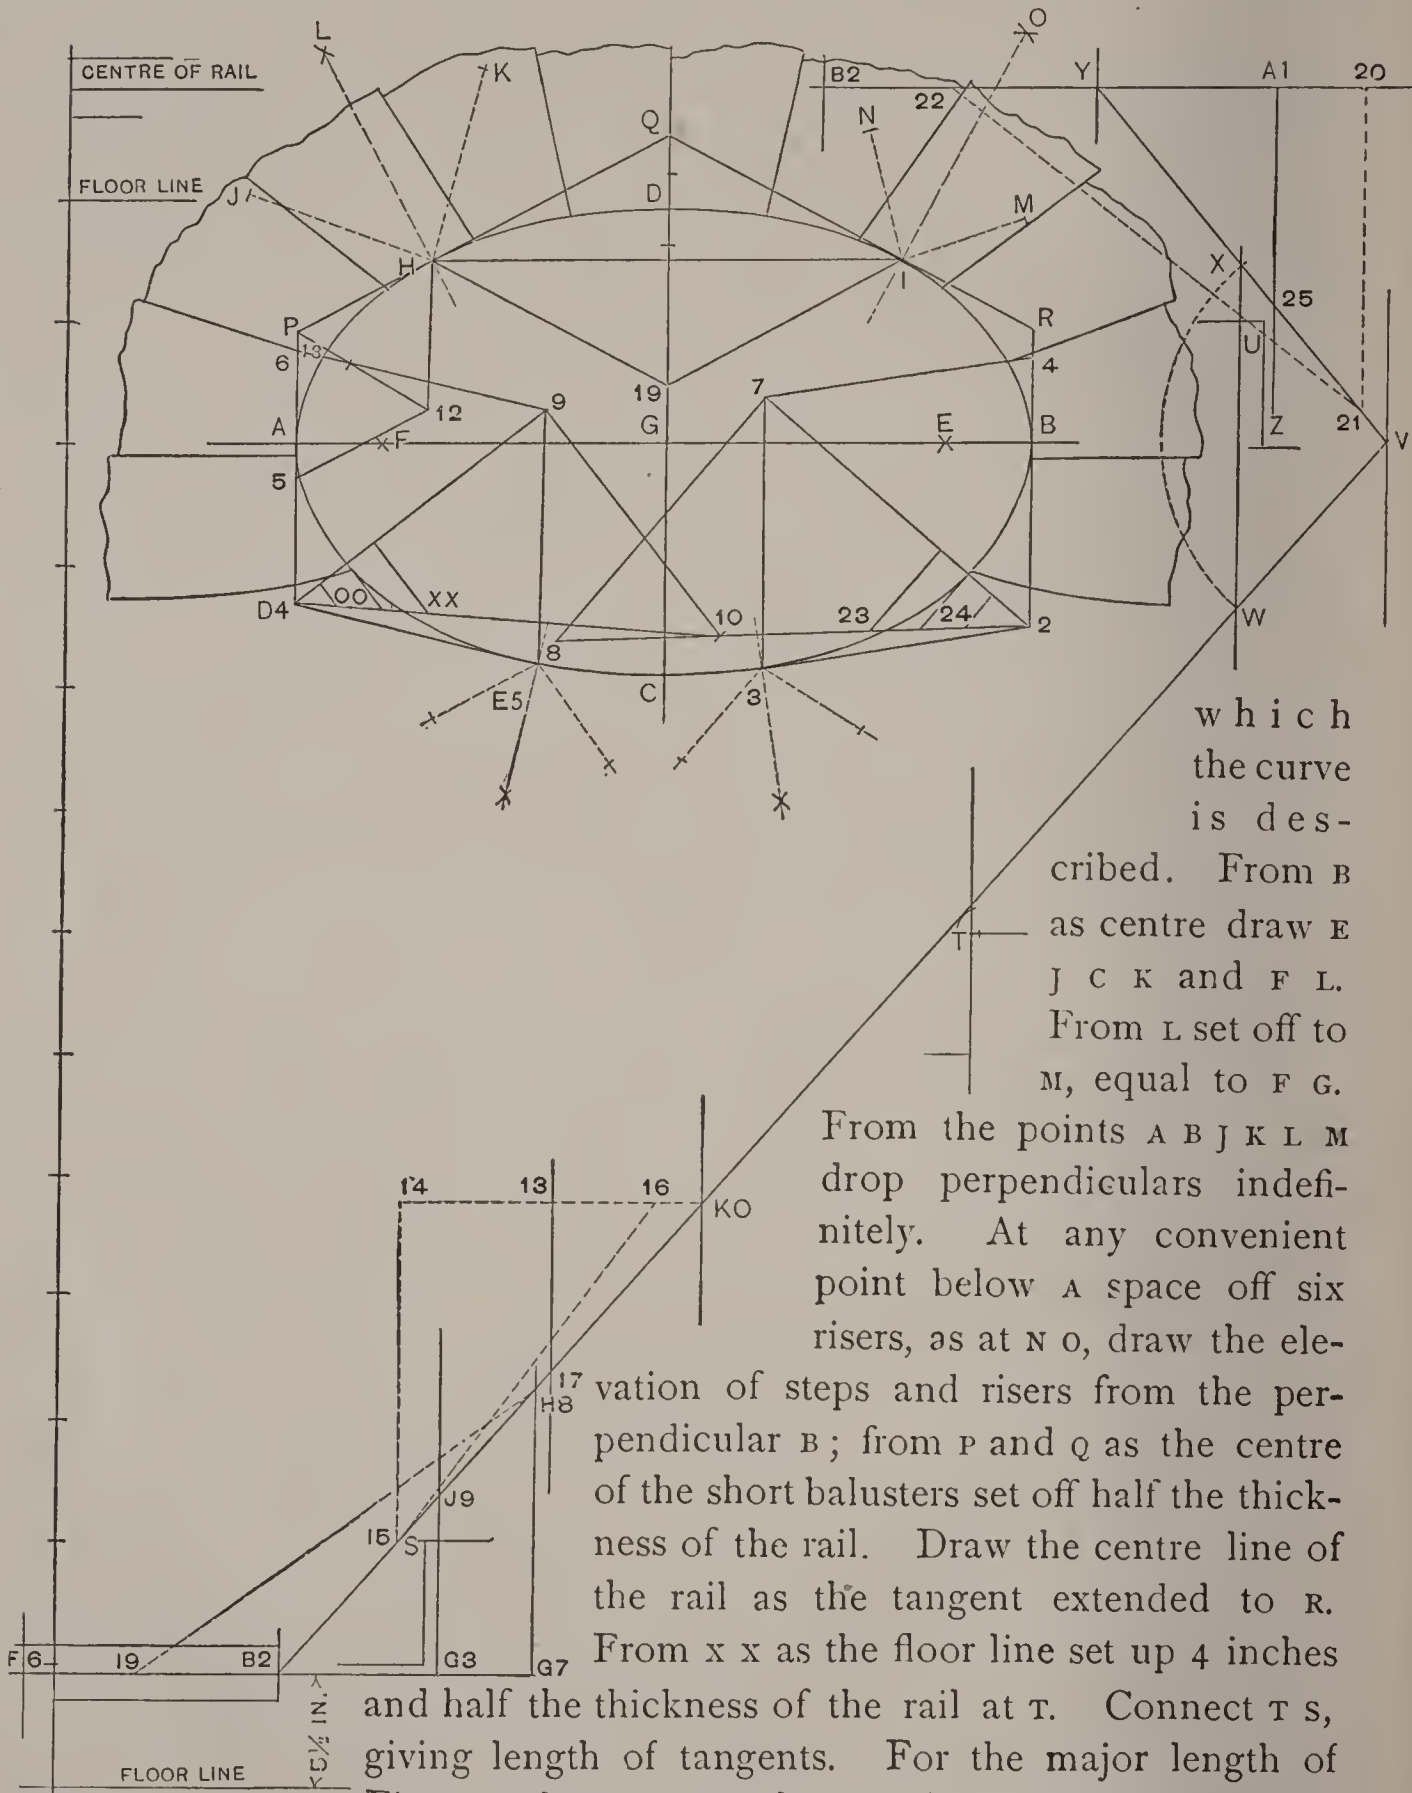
PLAN AND ELEVATION, ALL OBTUSE ANGLES.
